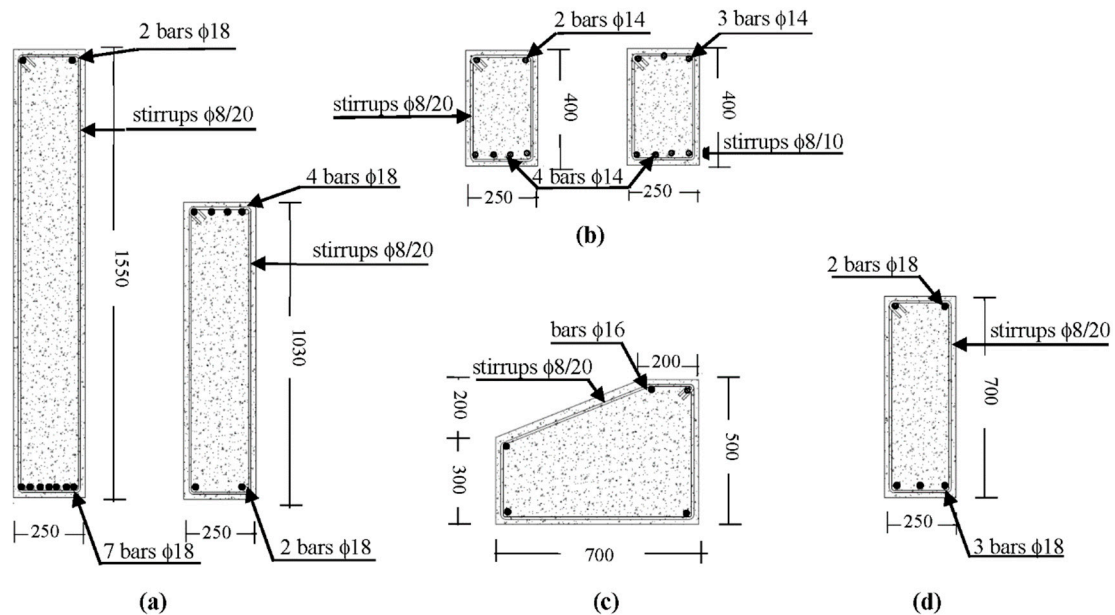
Redrawn cross sections of: (a) roof beams—half-span and ends; (b) top longitudinal beams TB—half-span and ends; (c) intermediate longitudinal beams IB; (d) columns (dimensions in millimeters).
